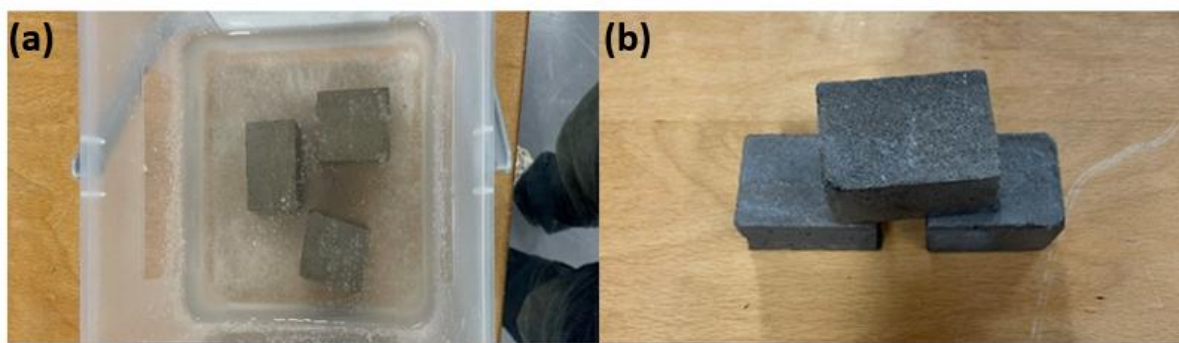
(a) Cubes placed inside a container. (b) Cube dimensions.
